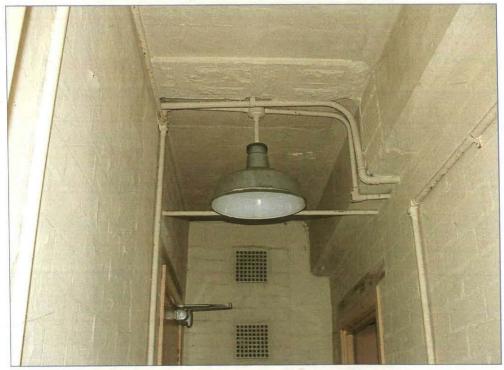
Light shade in ground floor corridor to the Tank Room and Boiler Room
